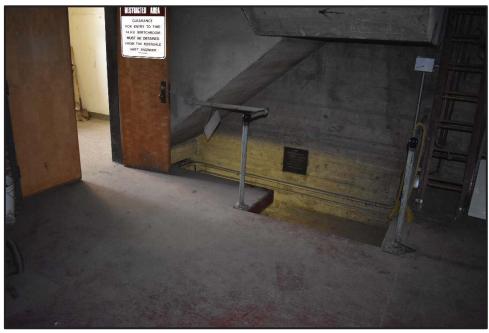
Typical Example of an Exit Stair Not Enclosed and Fire Separated
